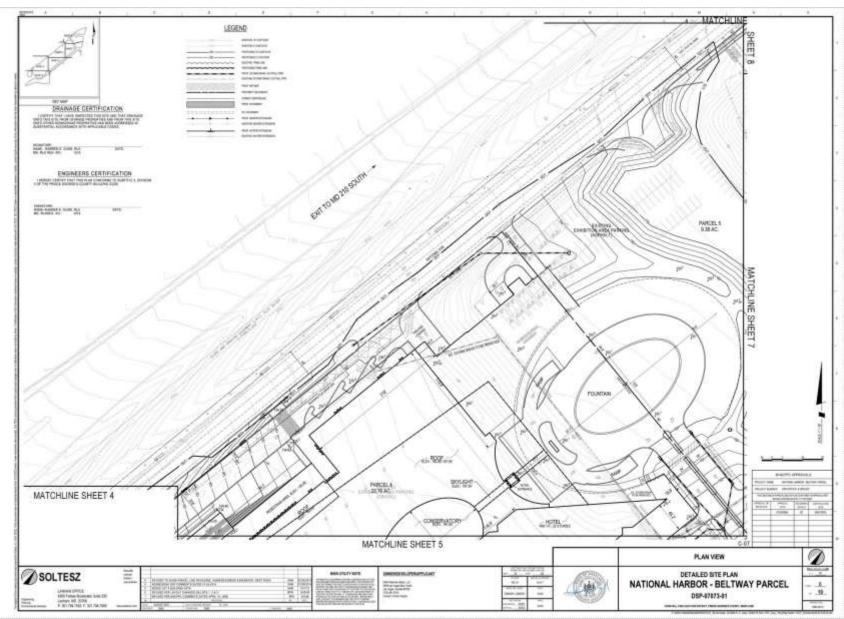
DETAILED SITE PLAN SET (PAGE 5 OF 10)
